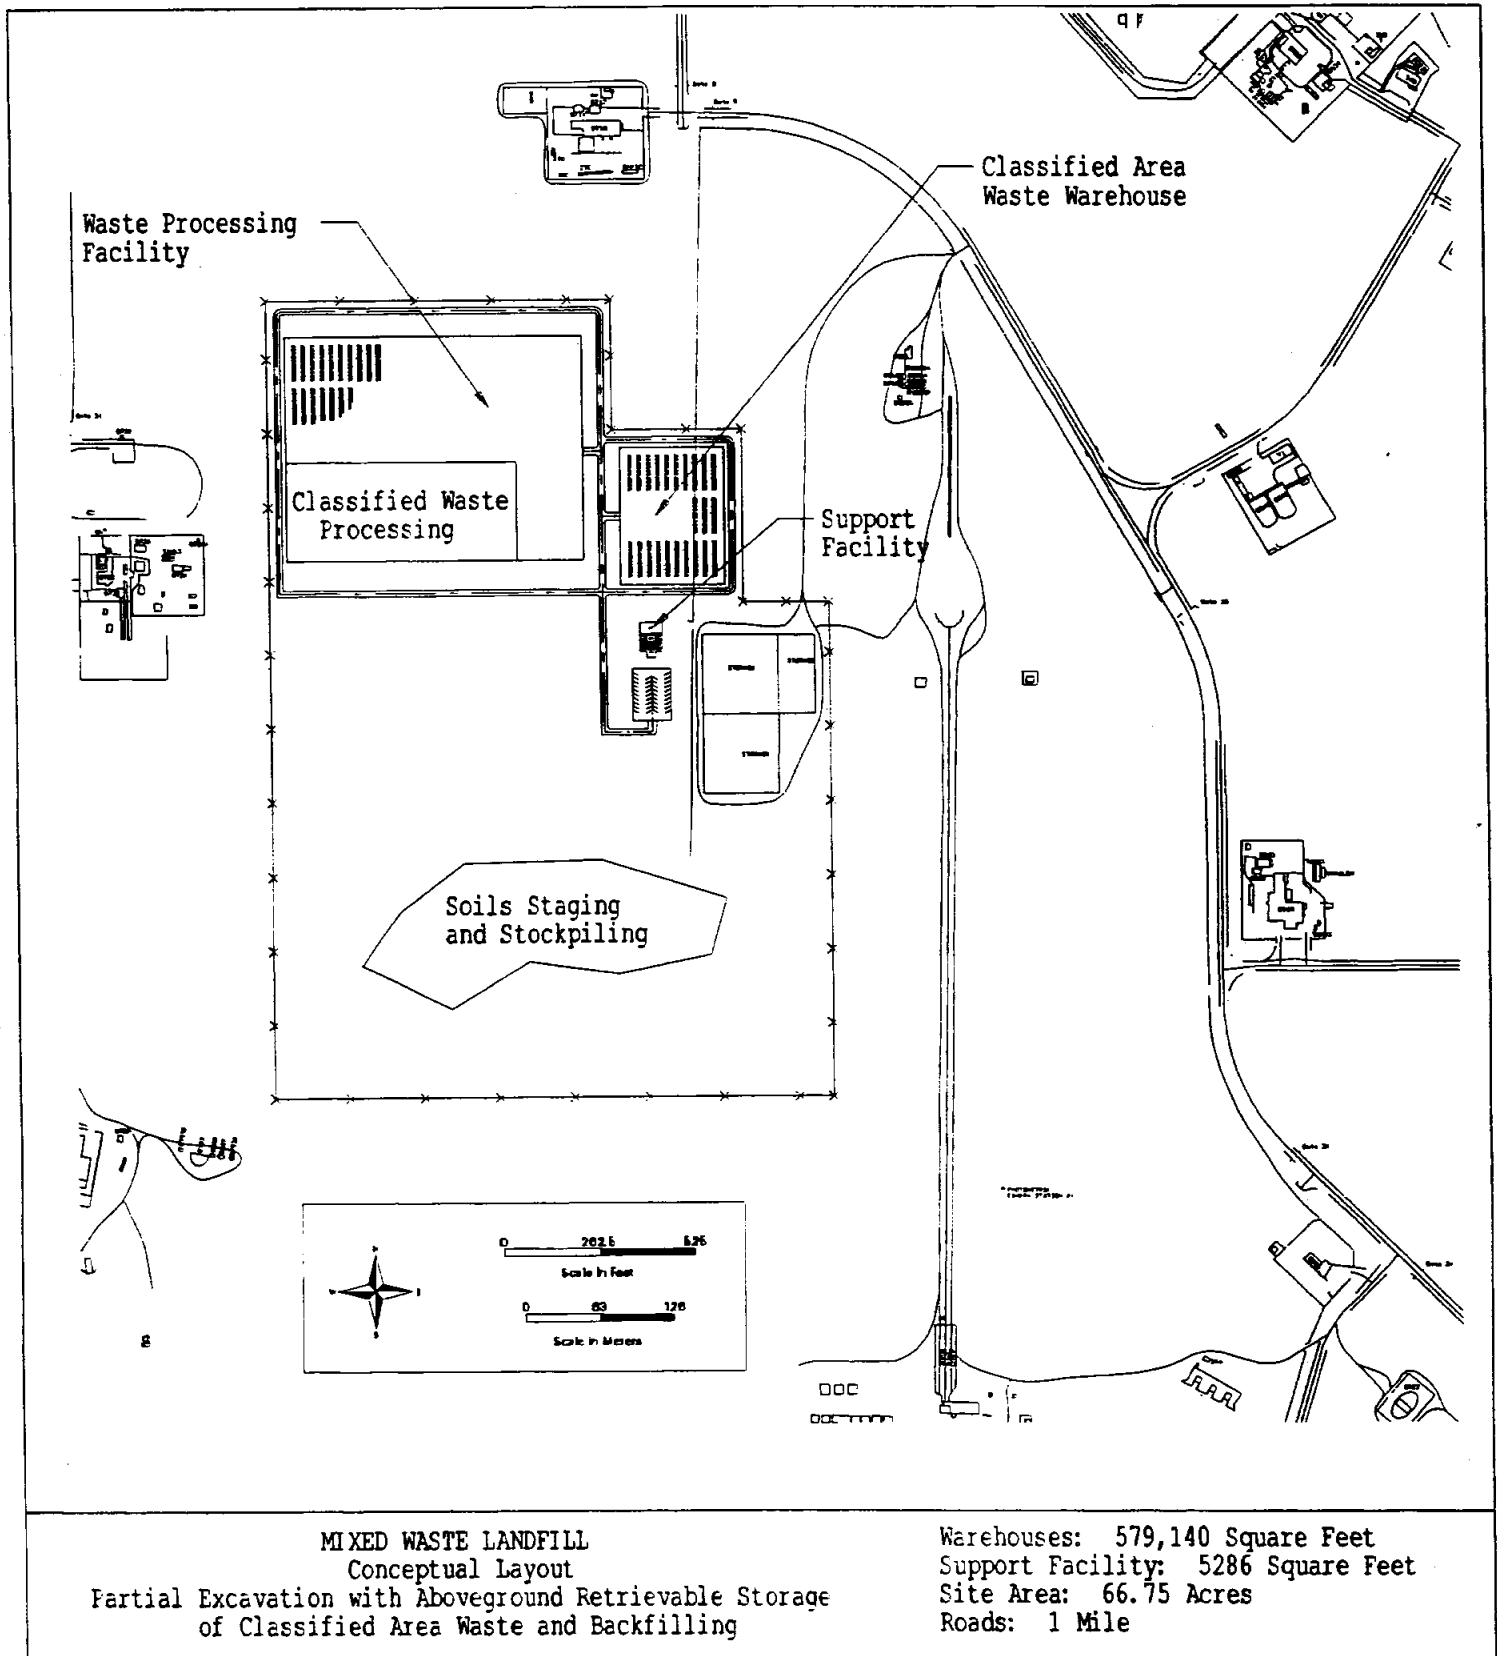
Partial Excavation with Aboveground Retrievable Storage and Backfilling
